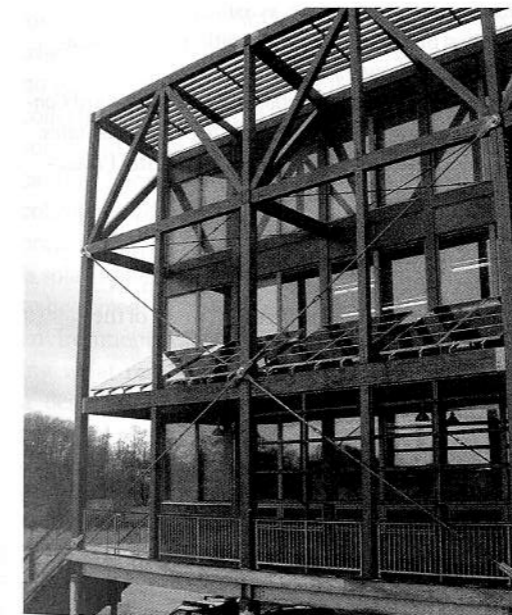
South (bay side) façade of the Philip Merrill Environmental Center showing PV panels, daylighting/solar apertures, and shading elements. Energy collection has informed this façade. (Photo © 2004 Walter Grondzik; all rights reserved.)
